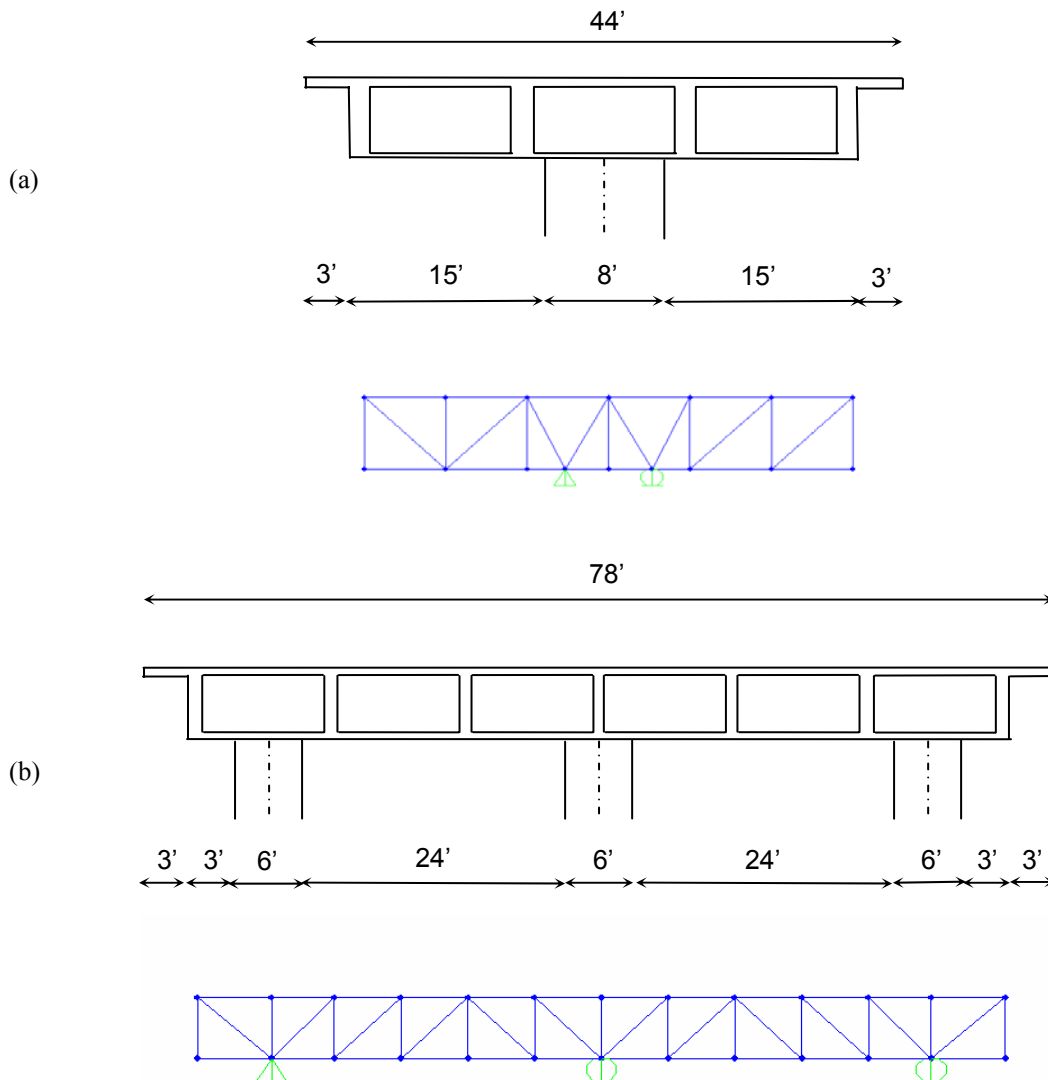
Cross Section Dimensions and Truss Idealization of (a) One-column bent cap, (b) Three-column bent cap
